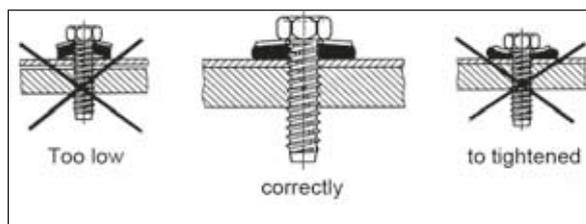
Design of screw connections (s. also IFBS assembly guidelines)
